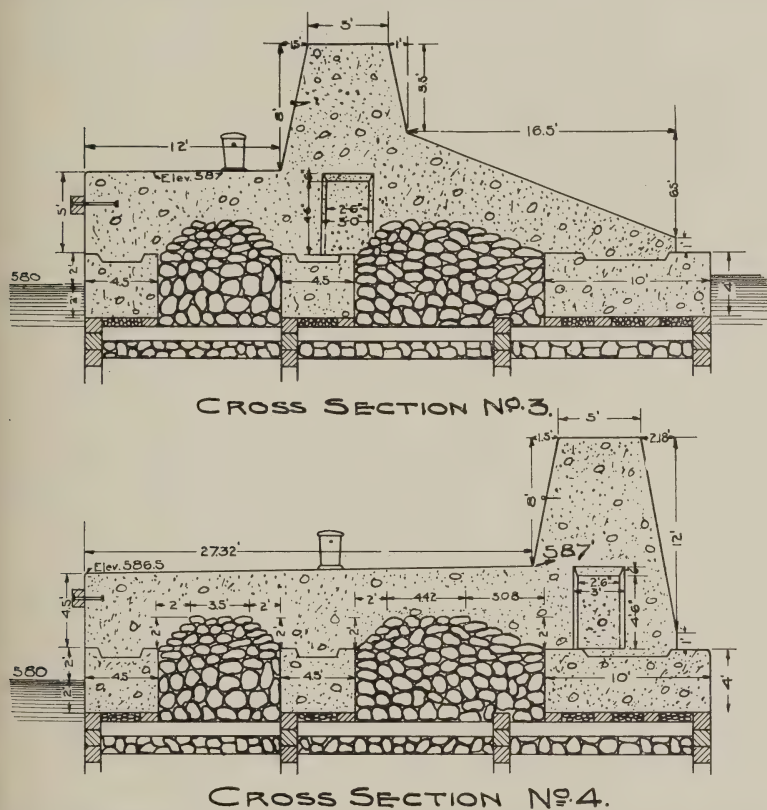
Cross section of concrete superstructure of the main breakwater, Harbor Beach, Mich., as actually constructed.
